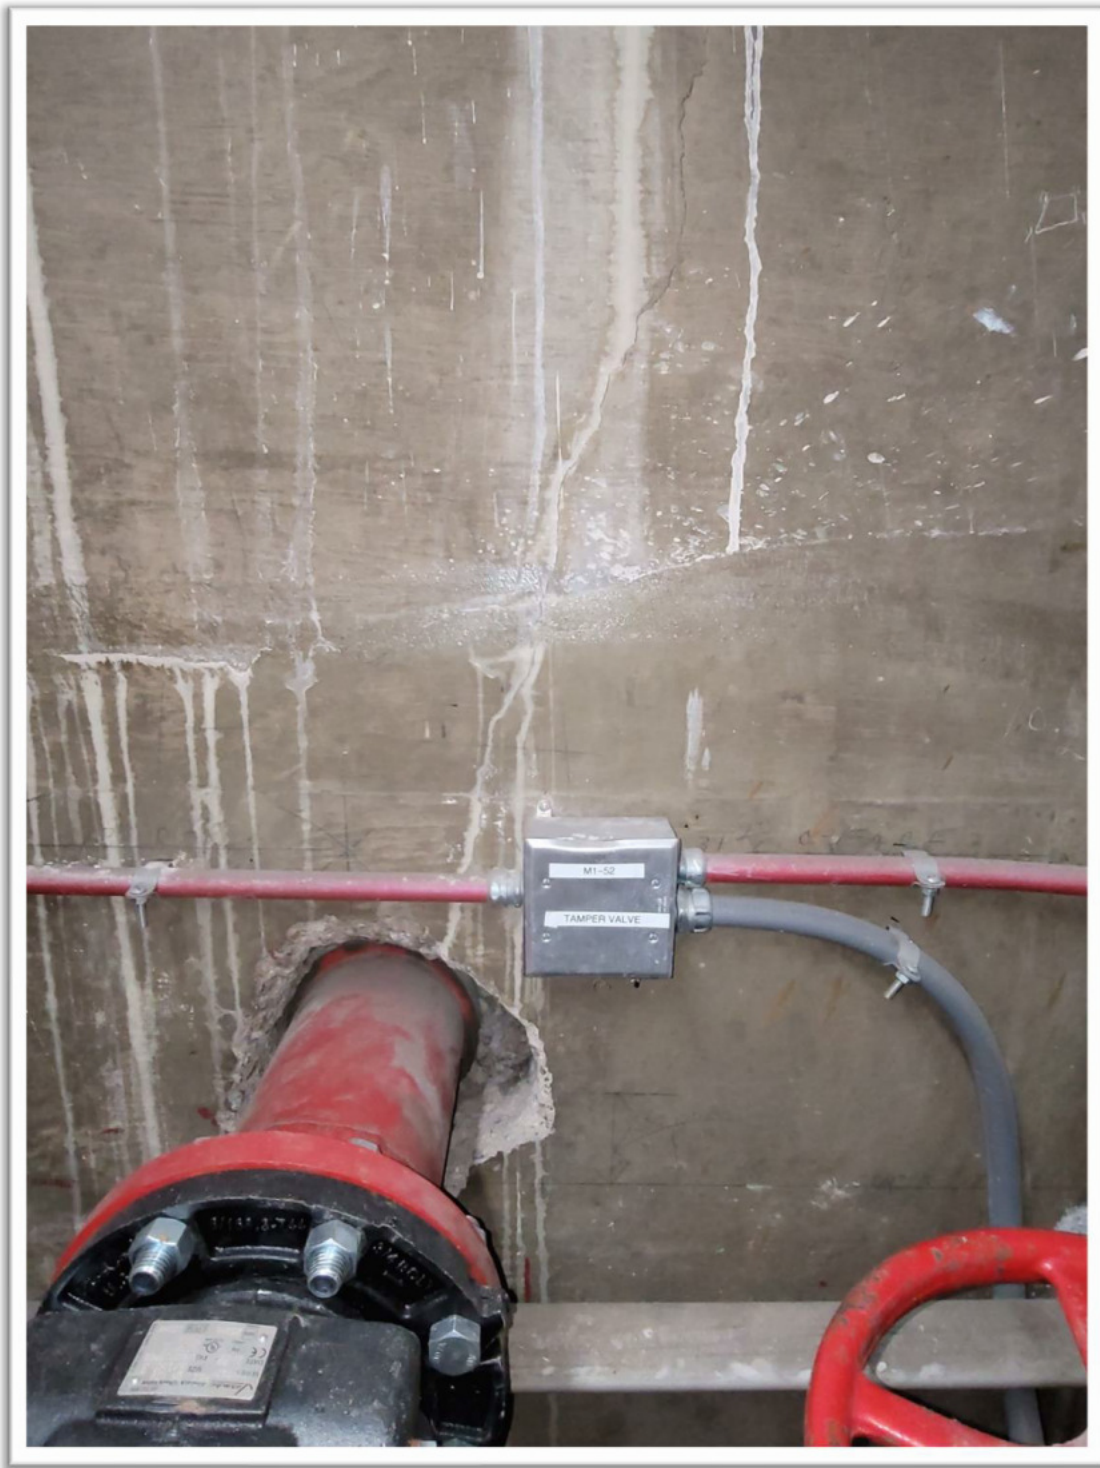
Concrete wall mechanical cracks due to the pipe installation.
